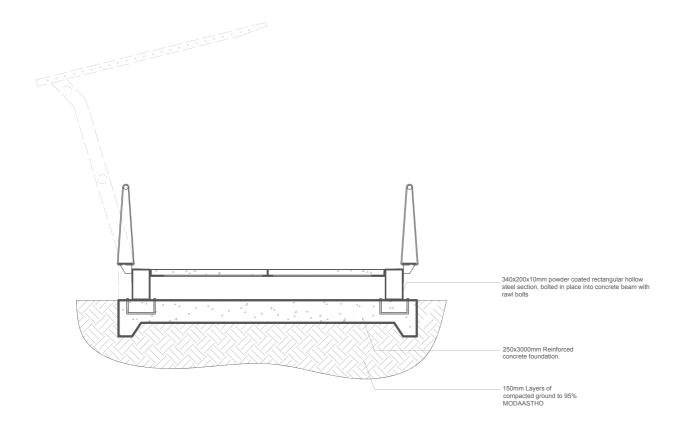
Section through pedestrian bridge over retention dam – foundation
